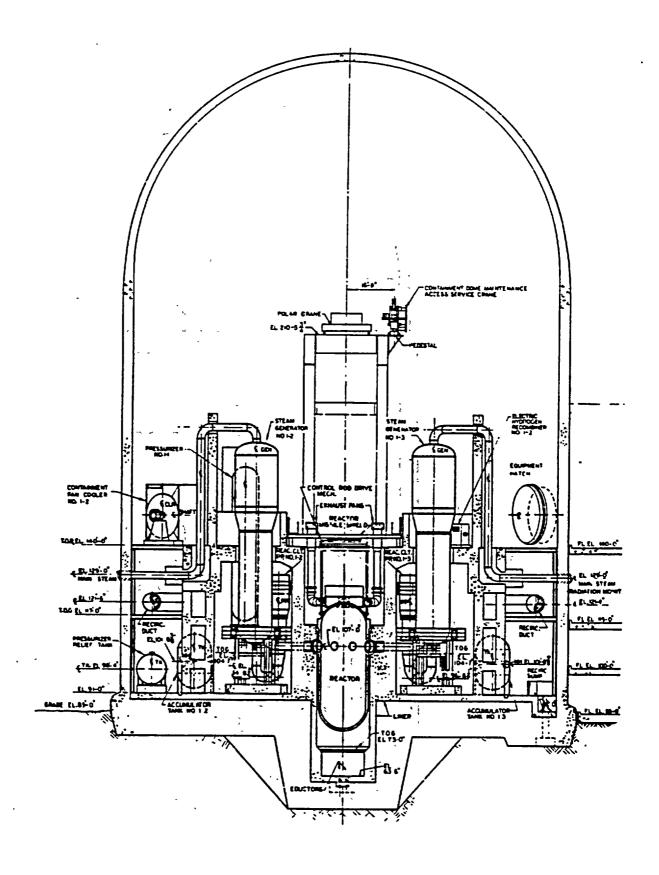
Diablo Canyon Large, Dry Containment (Reinforced Concrete with Steel Liner)
